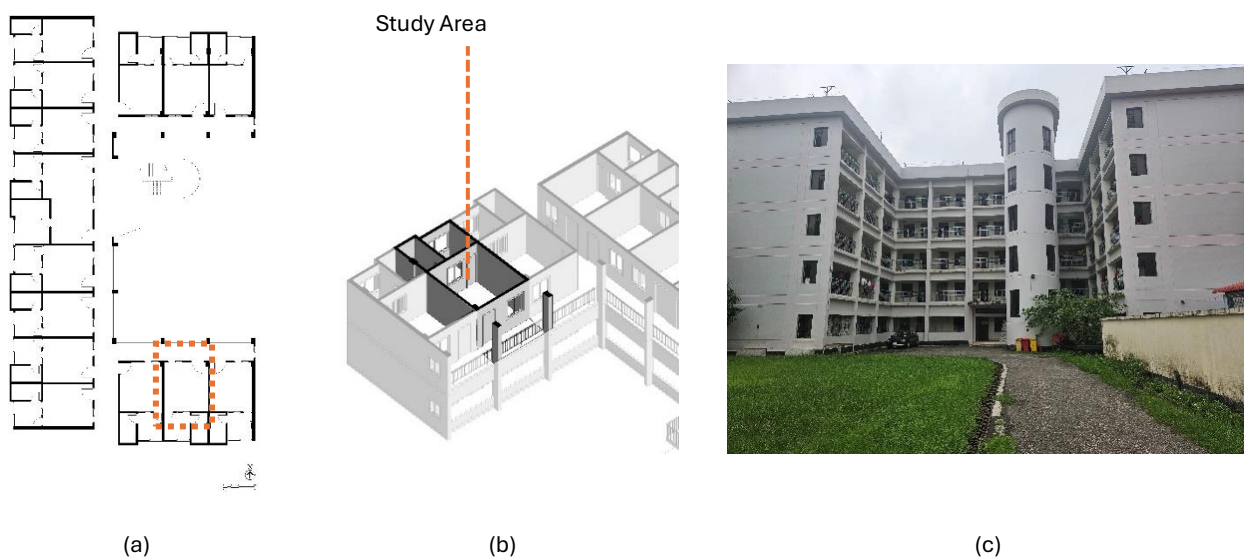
(a) Floor plan of the building; (b) Case study area; (c) Exterior view of the building
